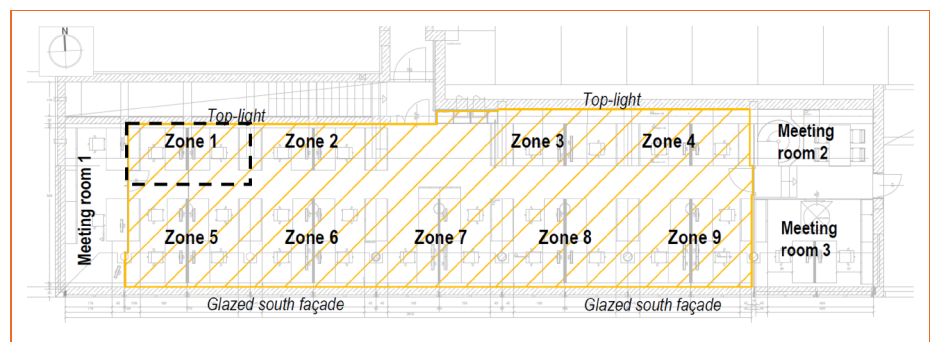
Floor plan of the Bartenbach Living Lab with nine separately controllable lighting zones.
